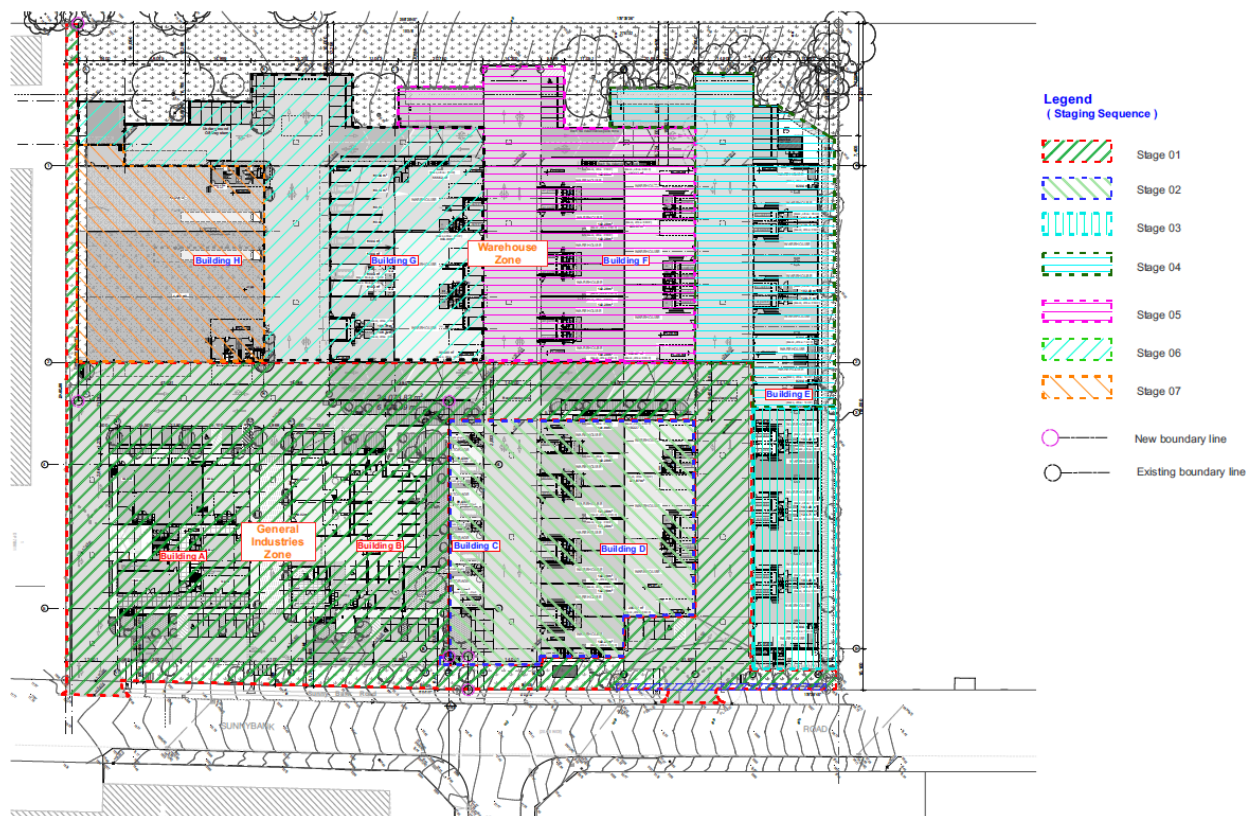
Extract of Proposed Staging Plan (Source: BHI Architects)
